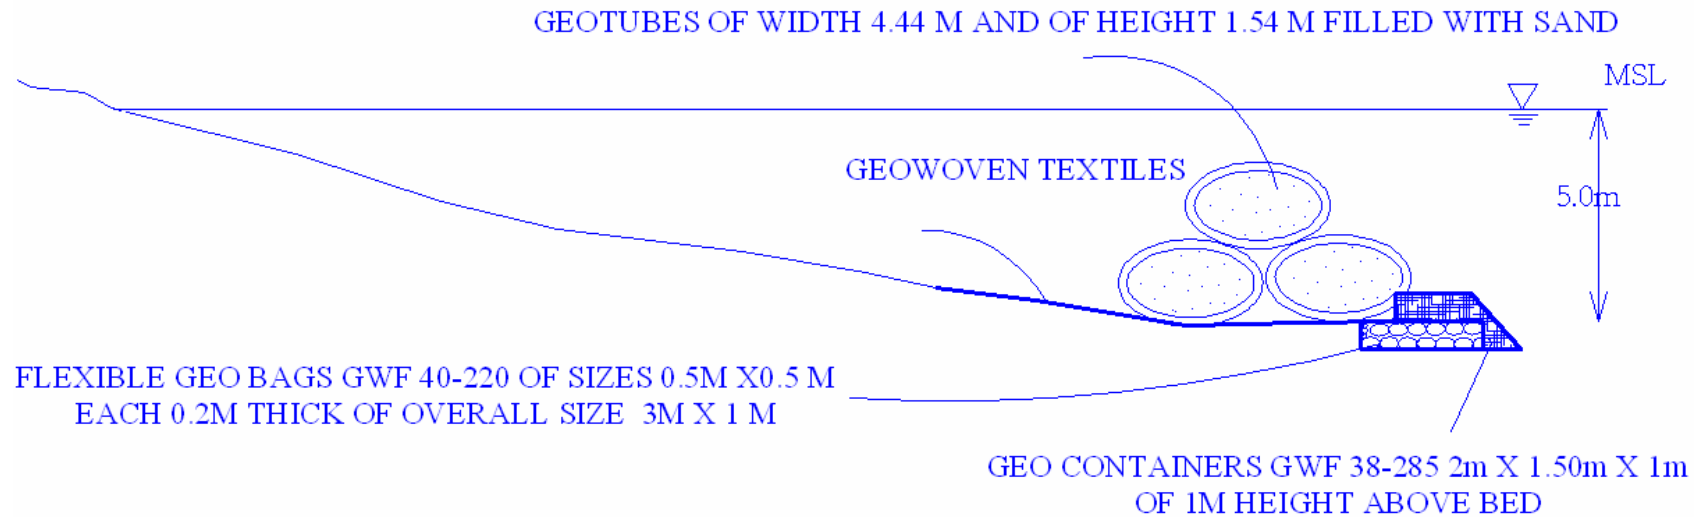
Proposed cross-section of geotubes as submerged reef at Janarthanapuram
